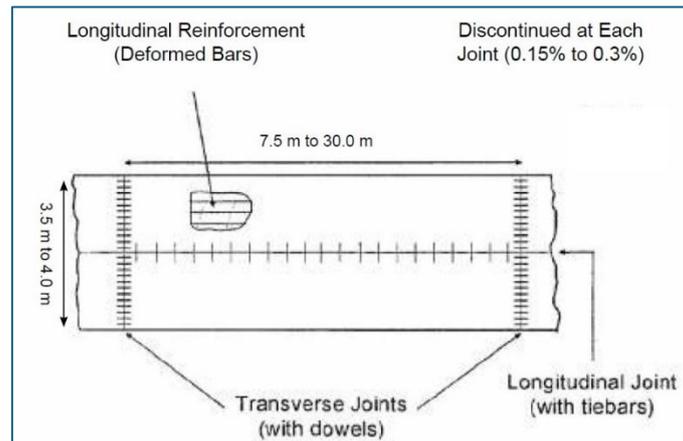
Plan view of Jointed Reinforced Concrete Pavement (JRCP)
